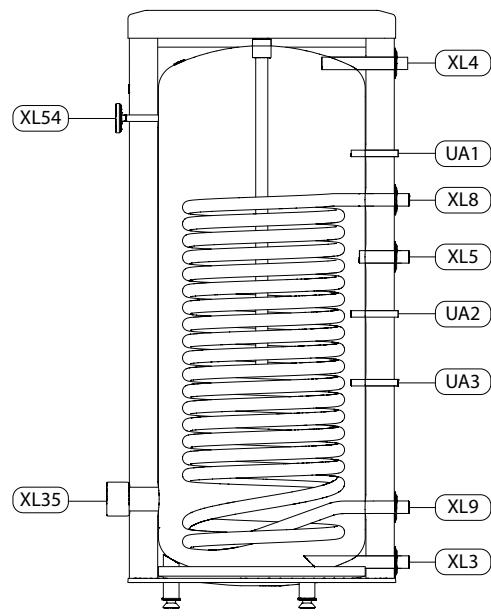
Connector pipe of the BA-ST 3015 - 1F storage tank
